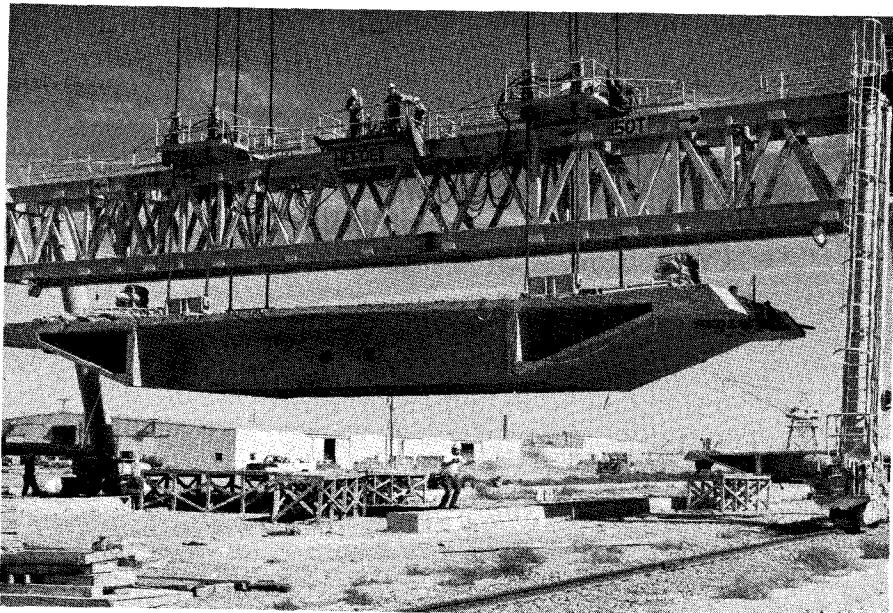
Giant precast segment in casting yard for Pasco-Kennewick Bridge over Columbia River in the State of Washington. (Courtesy: Arvid Grant, Olympia, Washington.)
